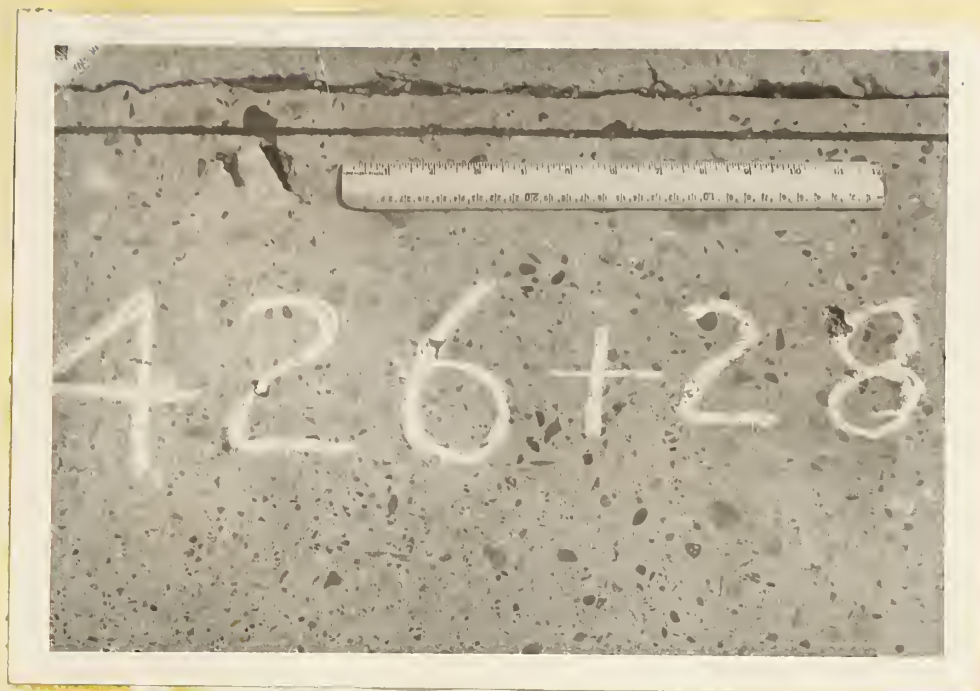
LONGITUDINAL CONSTRUCTION JOINT
